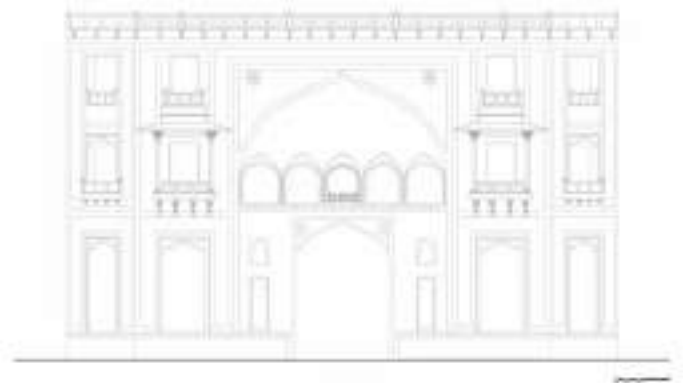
Elevation Drawing of Azam Khan Ni Sarai
